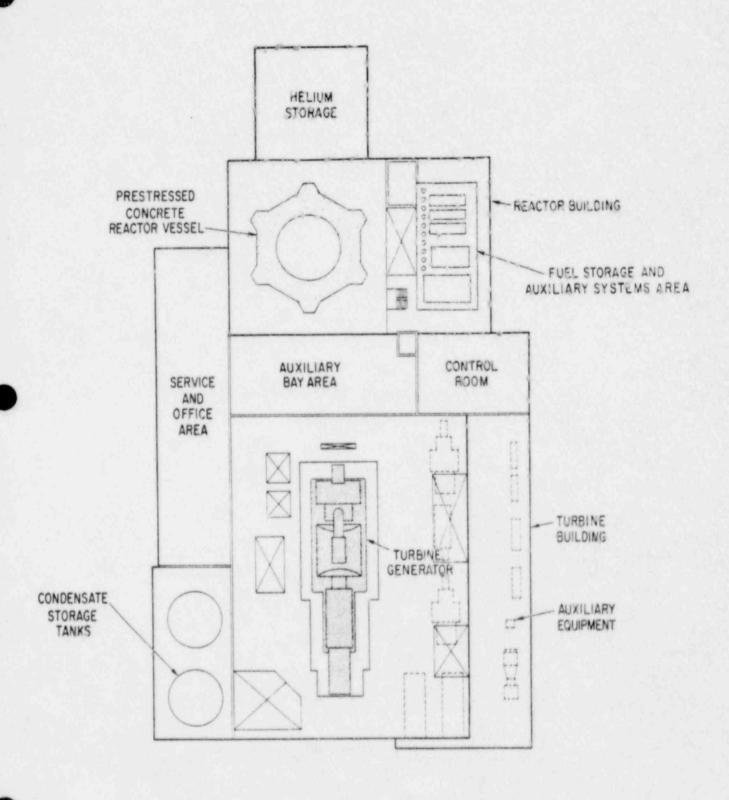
Plan View of Reactor Building and Turbine Building
